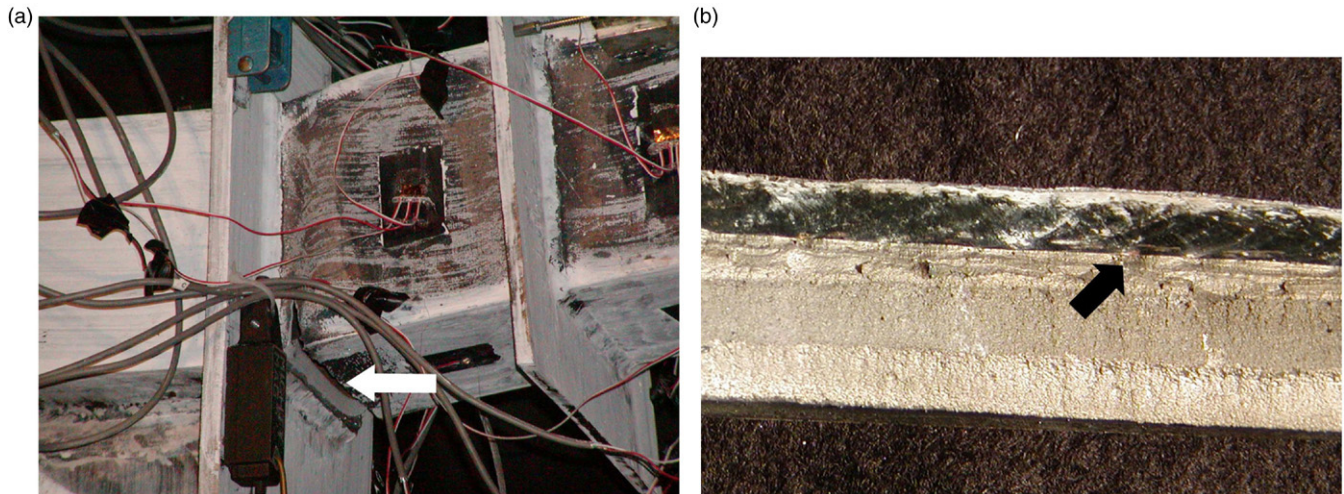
(a) Link fracture at 0.151 rad during Cycle 20 (b) fracture surface exposed after testing.
